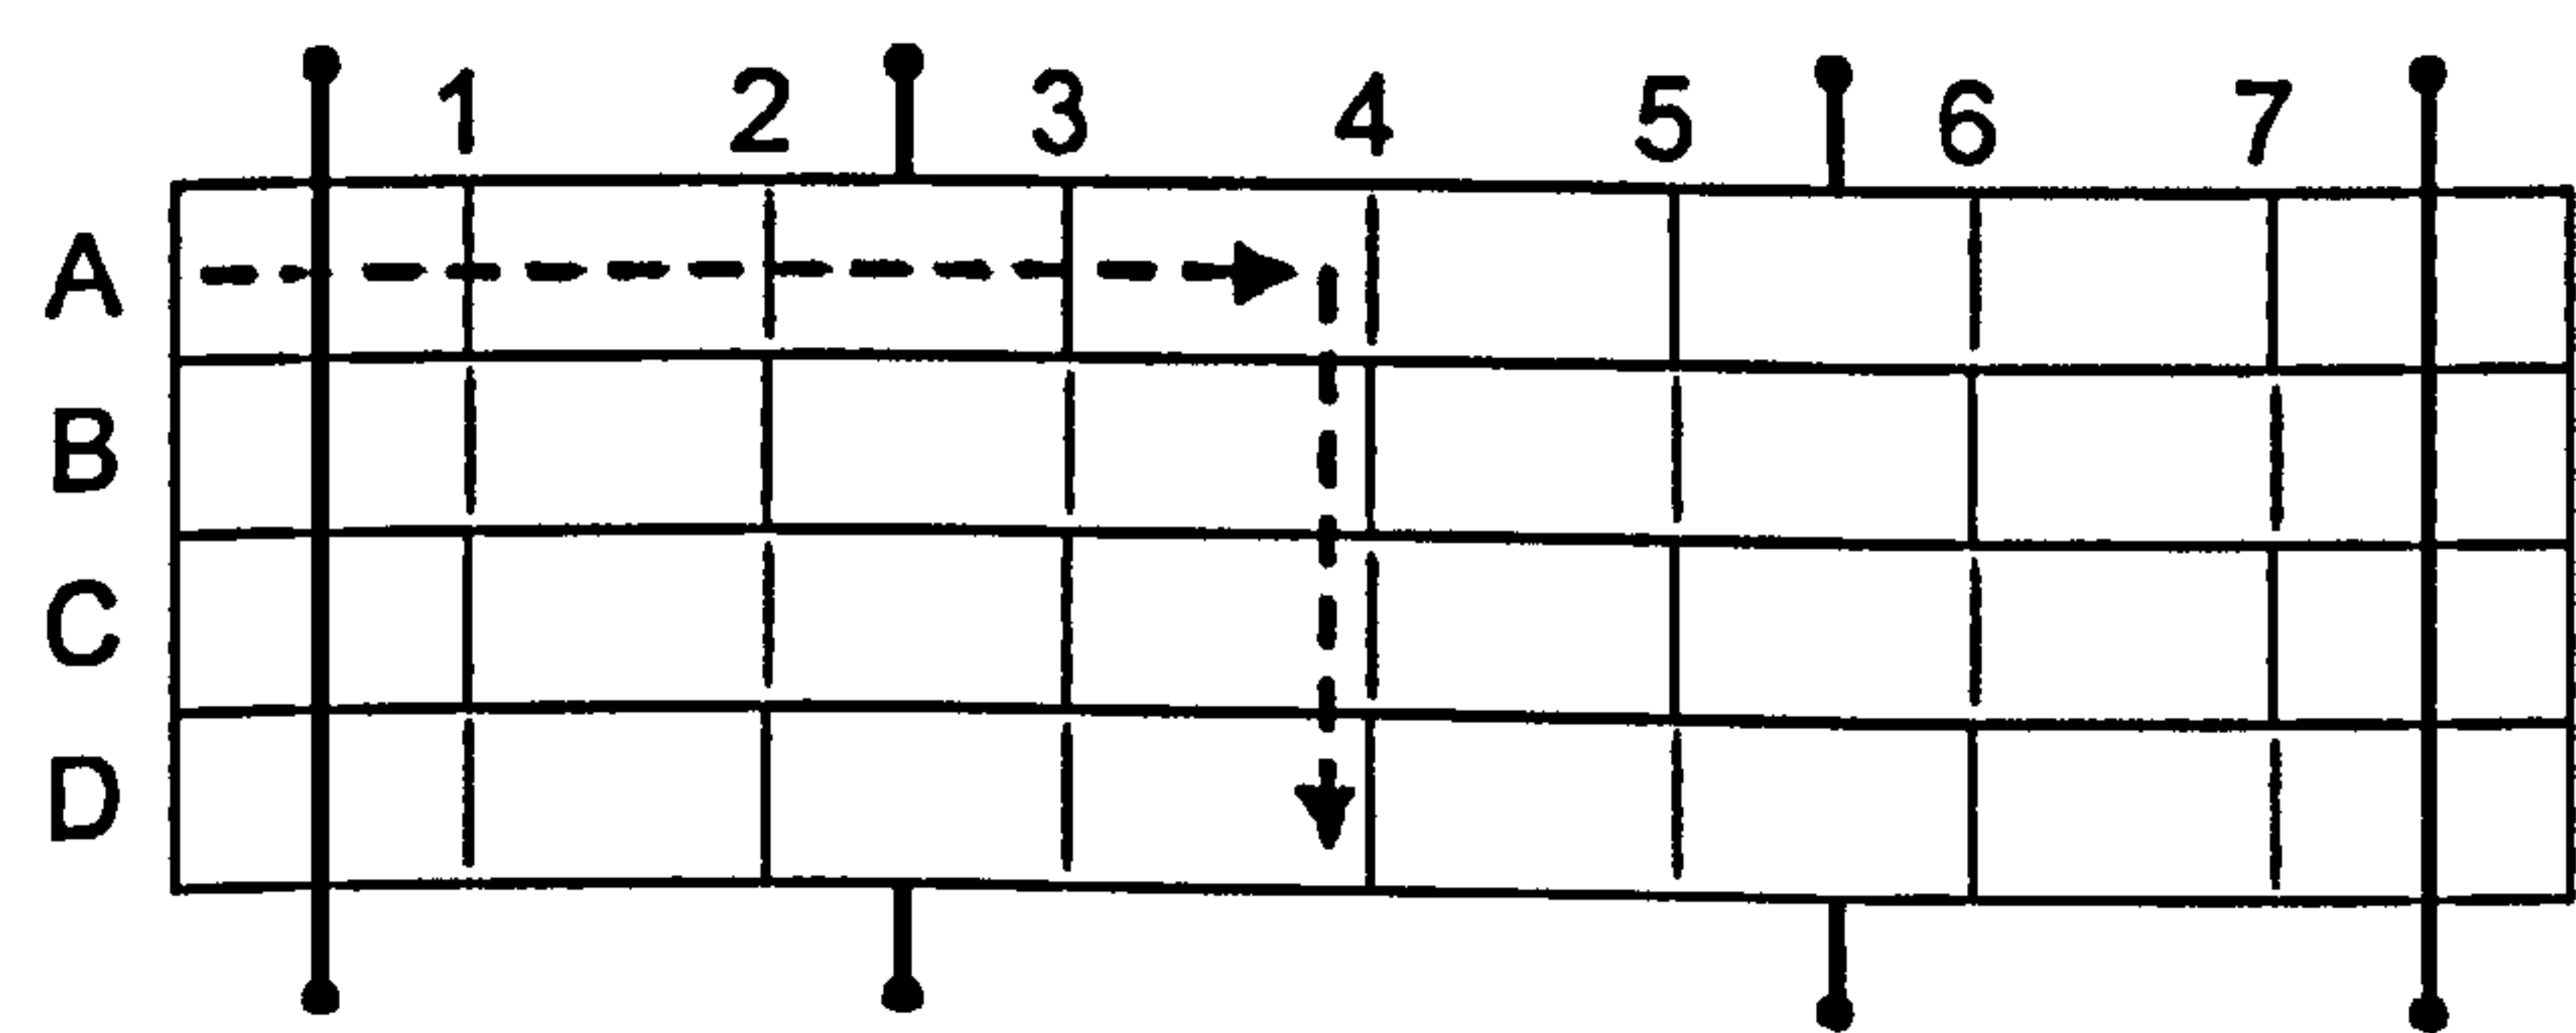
P wallettes – path taken for reading wallette failure pattern
